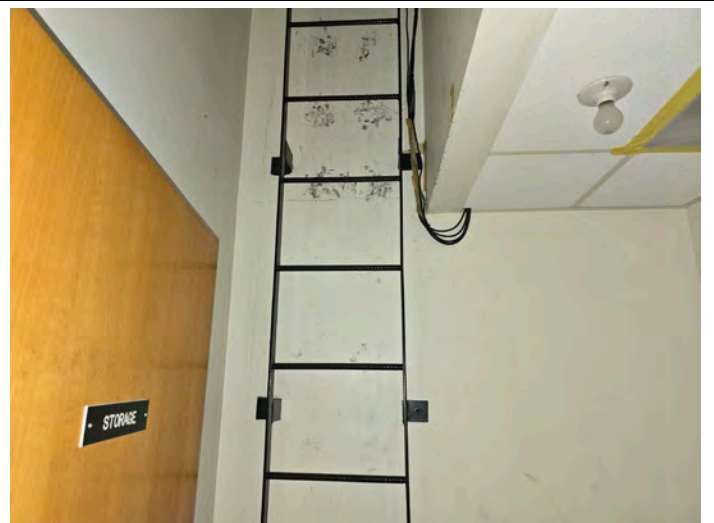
Black metal roof access ladder near the 2nd floor bathrooms - LBP
